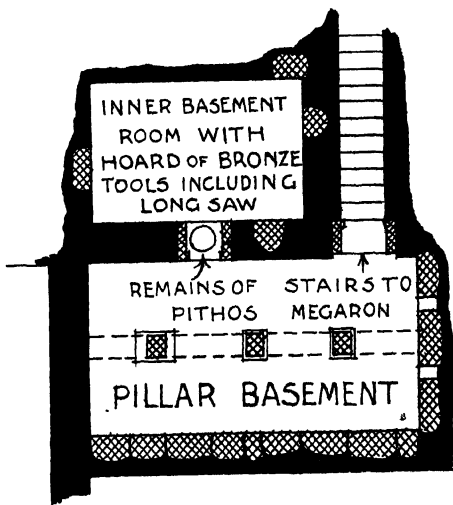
PLAN OF PILLAR BASEMENT AND STORE-ROOM, SOUTH HOUSE.
